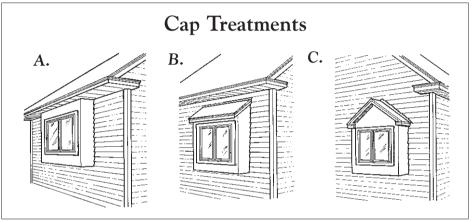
If the bumpout is directly below the eaves, a roof may not be necessary (A). When it's located lower (B), or on a two-story wall or gable end (C), use a roof style that matches the house.
